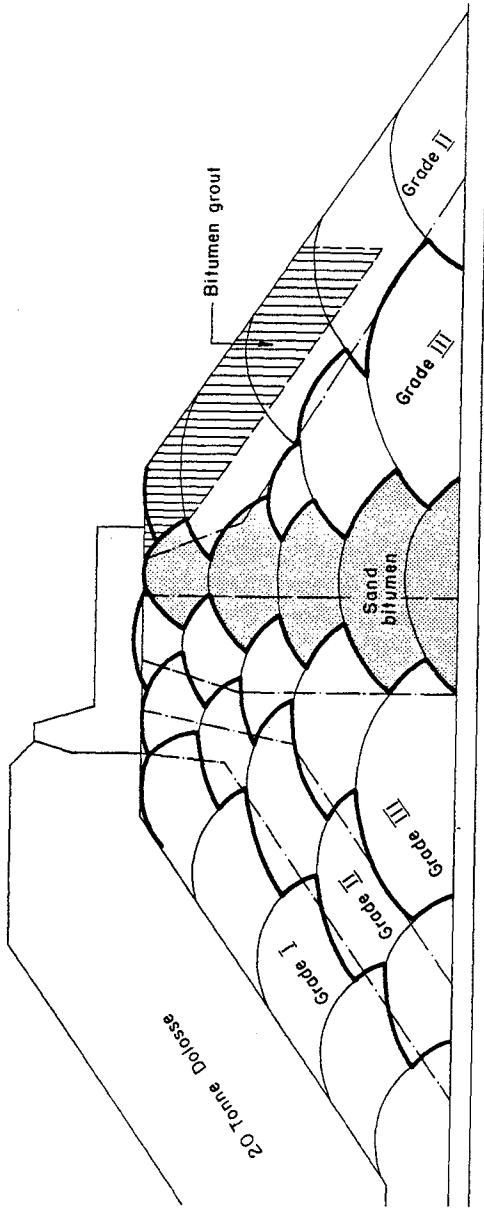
ACTUAL BREAKWATER BUILDING PROFILE
